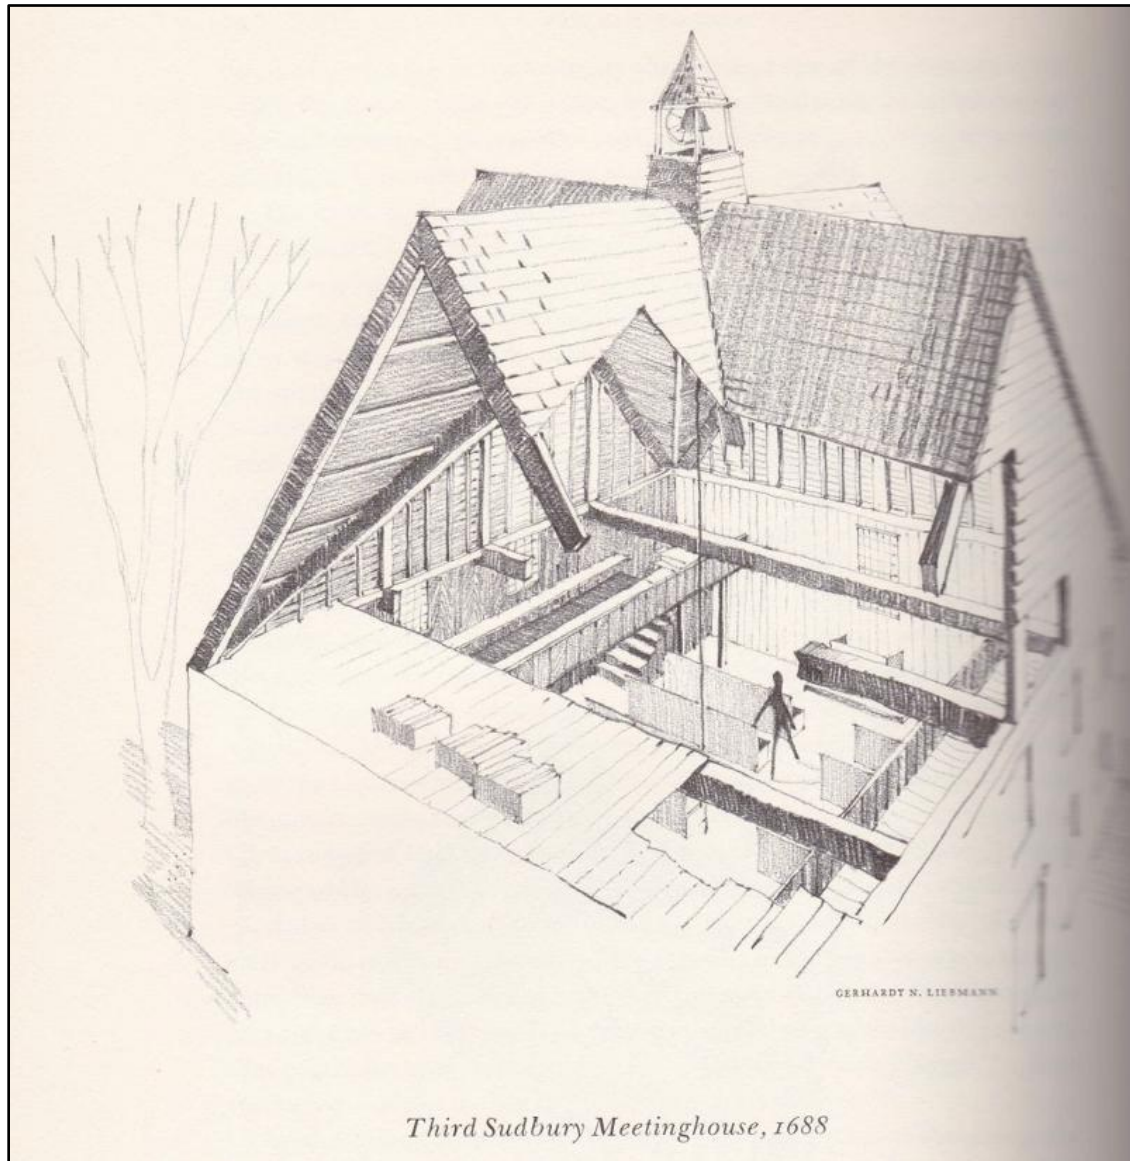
Conceptual drawing of the third meeting house (Powell 1963).
